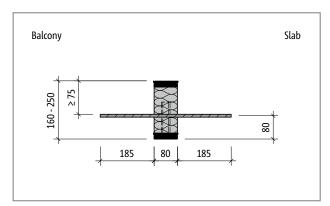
Schöck Isokorb® T type H-NN1: Product section
